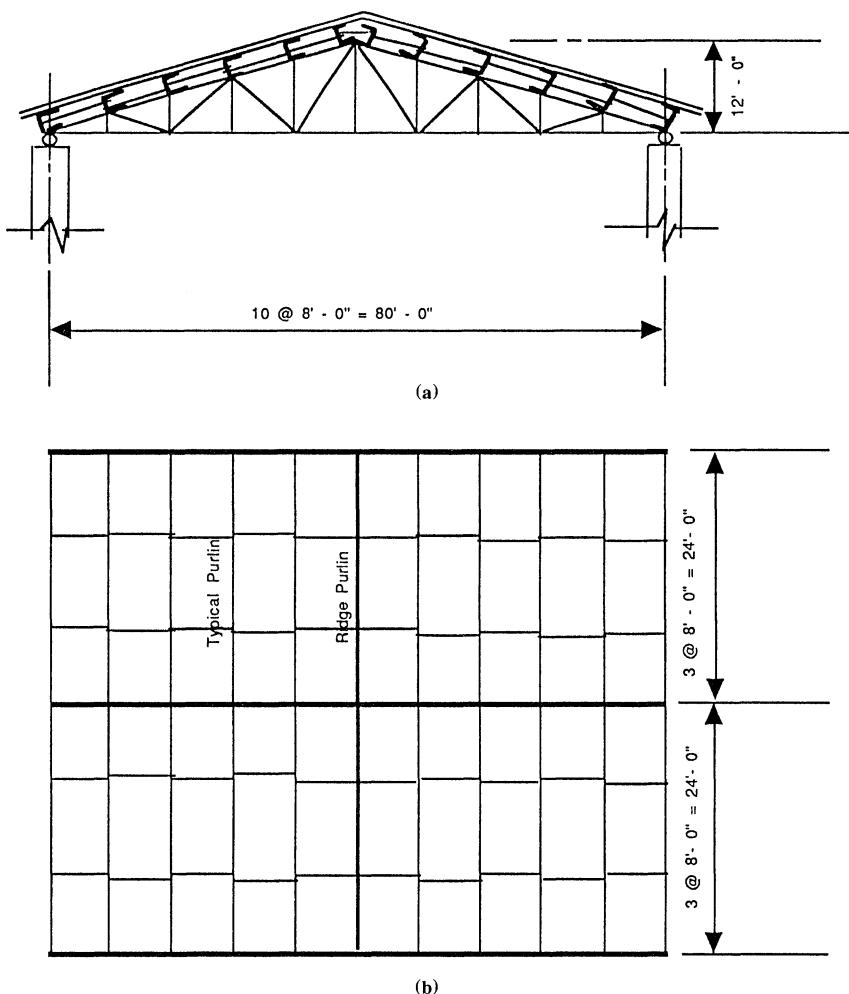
Long-span roof truss system. (a) Typical roof truss. (b) Plan of roof framing system.
